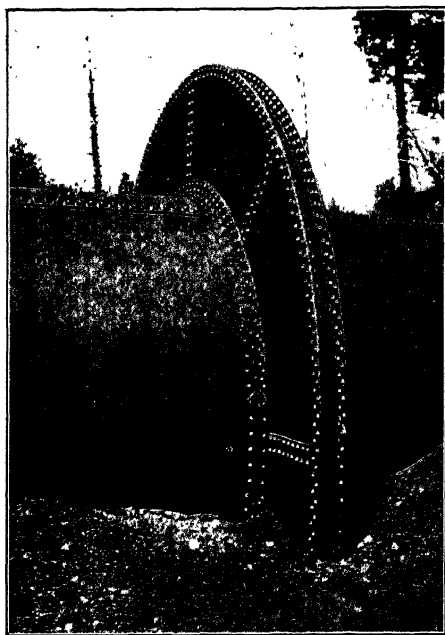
Expansion joint in 8.5 ft. riveted-steel pipe under low head.
